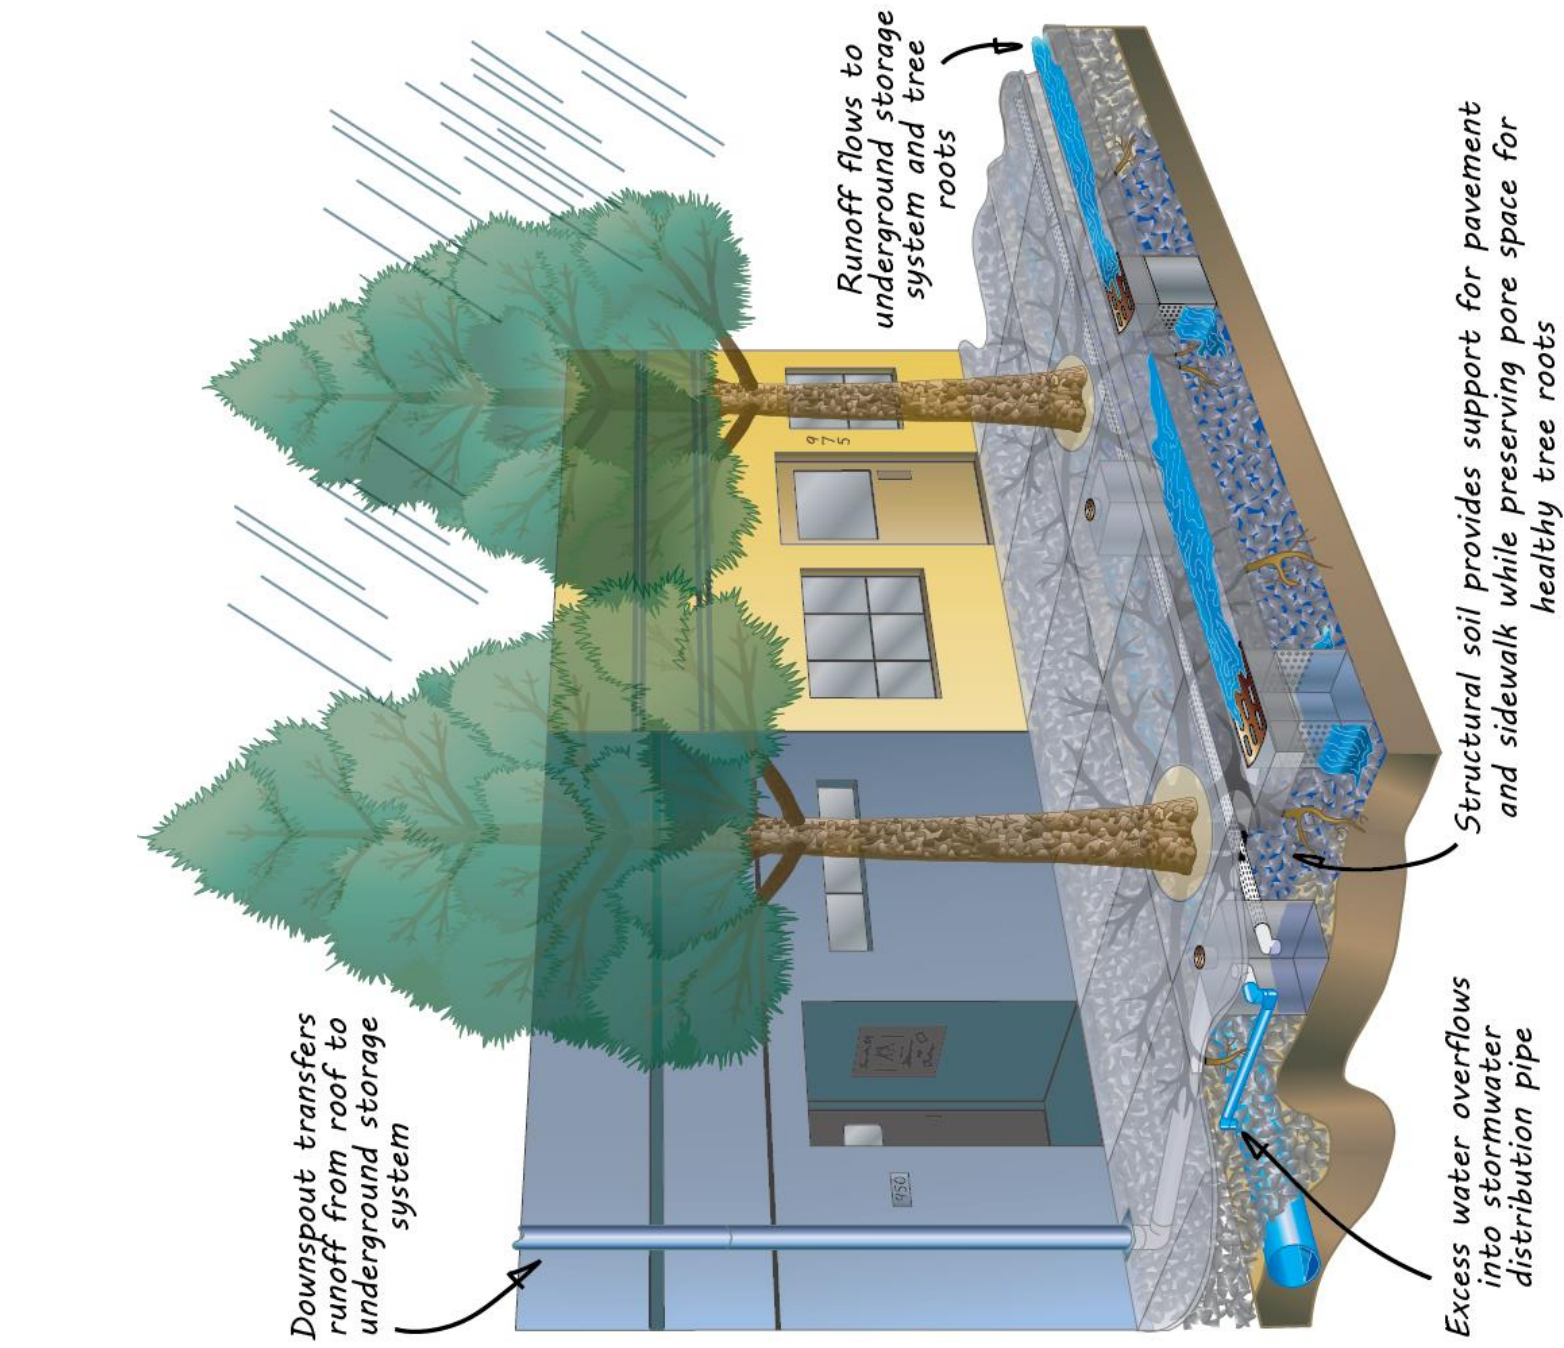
Structural soil is a highly porous, engineered aggregate mix, designed for use under asphalt and concrete as a load-bearing and leveling layer. Poor spaces allow for water infiltration and storage and also root growth.
